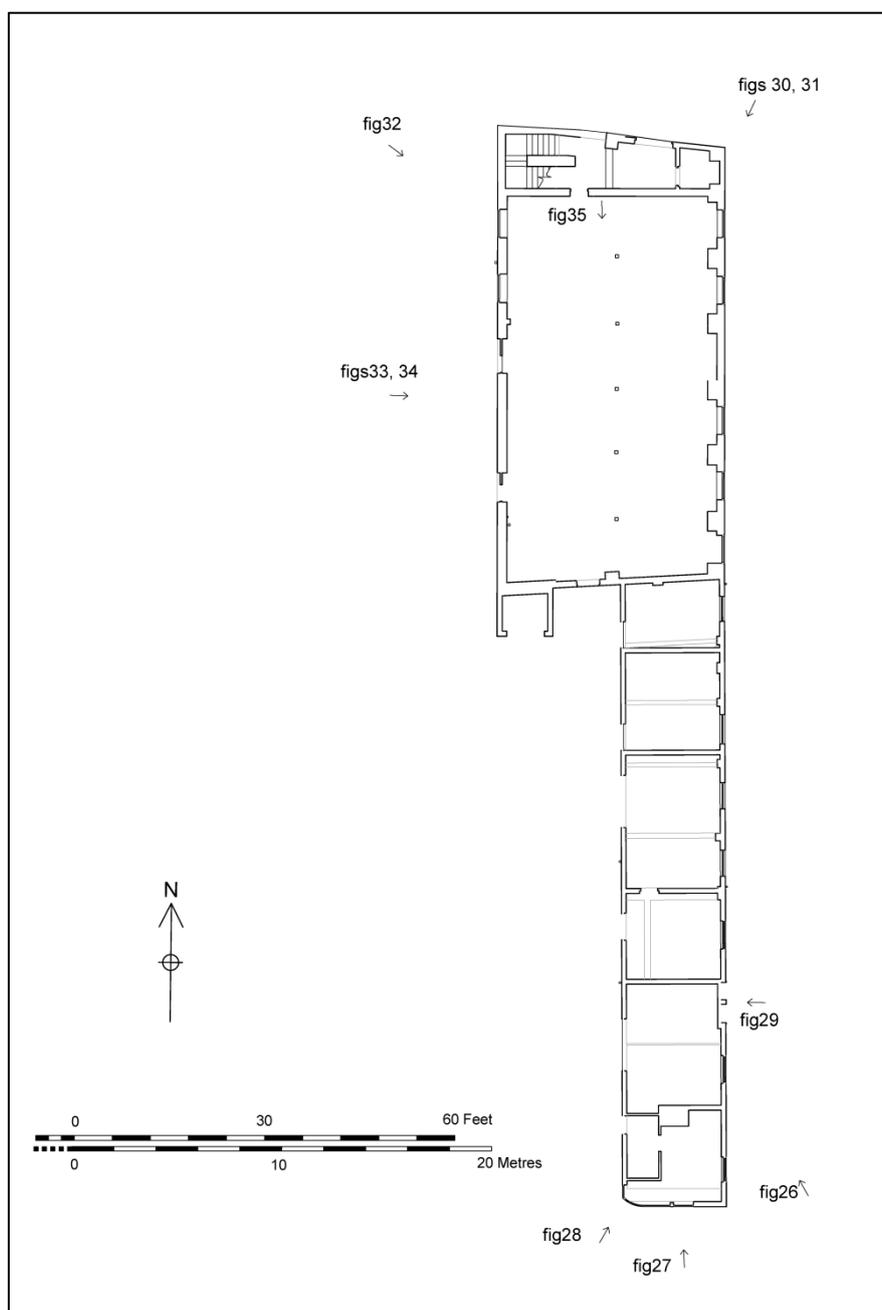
Location of selected photographs (figs 26-35) on ground floor plan of Bath Lane Mill and Cottages (plan produced by Greenhatch Architects).
